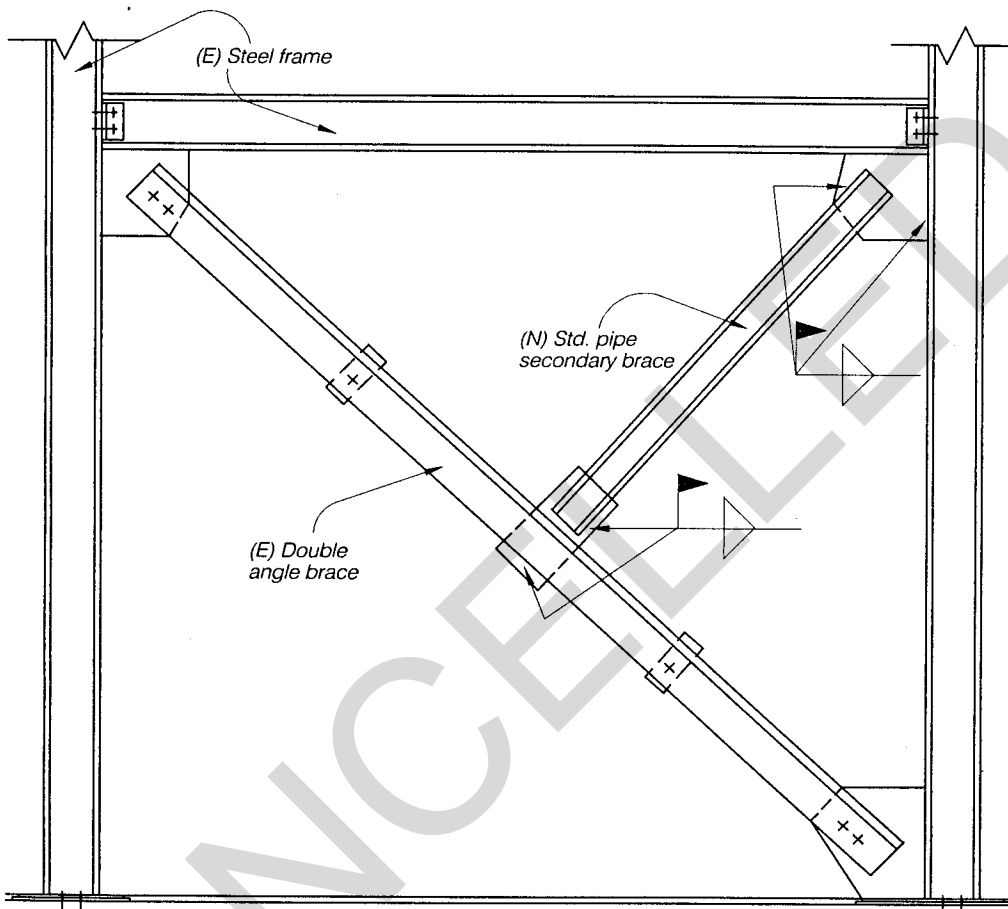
Strengthening an Existing Brace with Secondary Bracing
